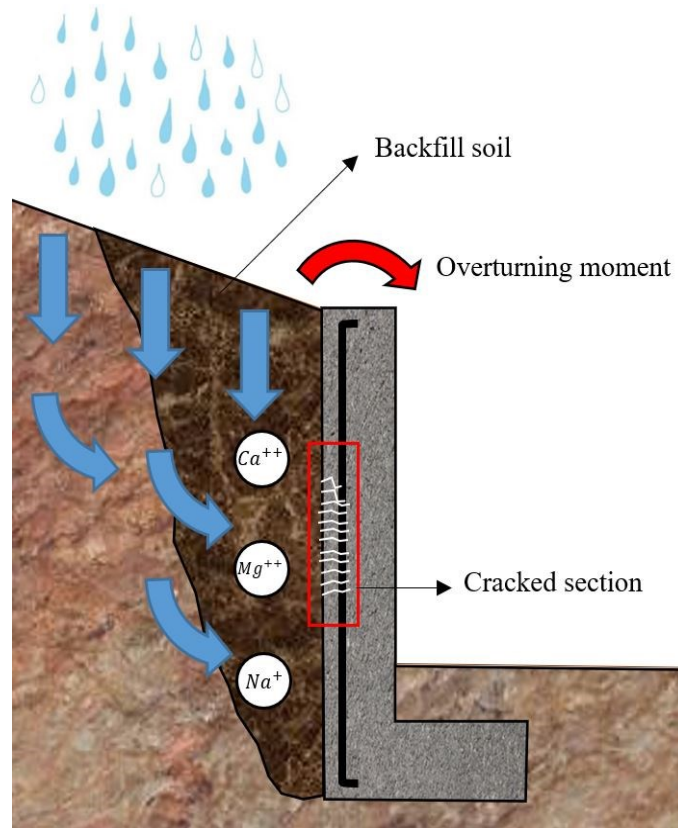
Schematic demonstration of backfill soil acting as the surrounding environment of a typical retaining wall with the possibility to promote self-healing of cracks
